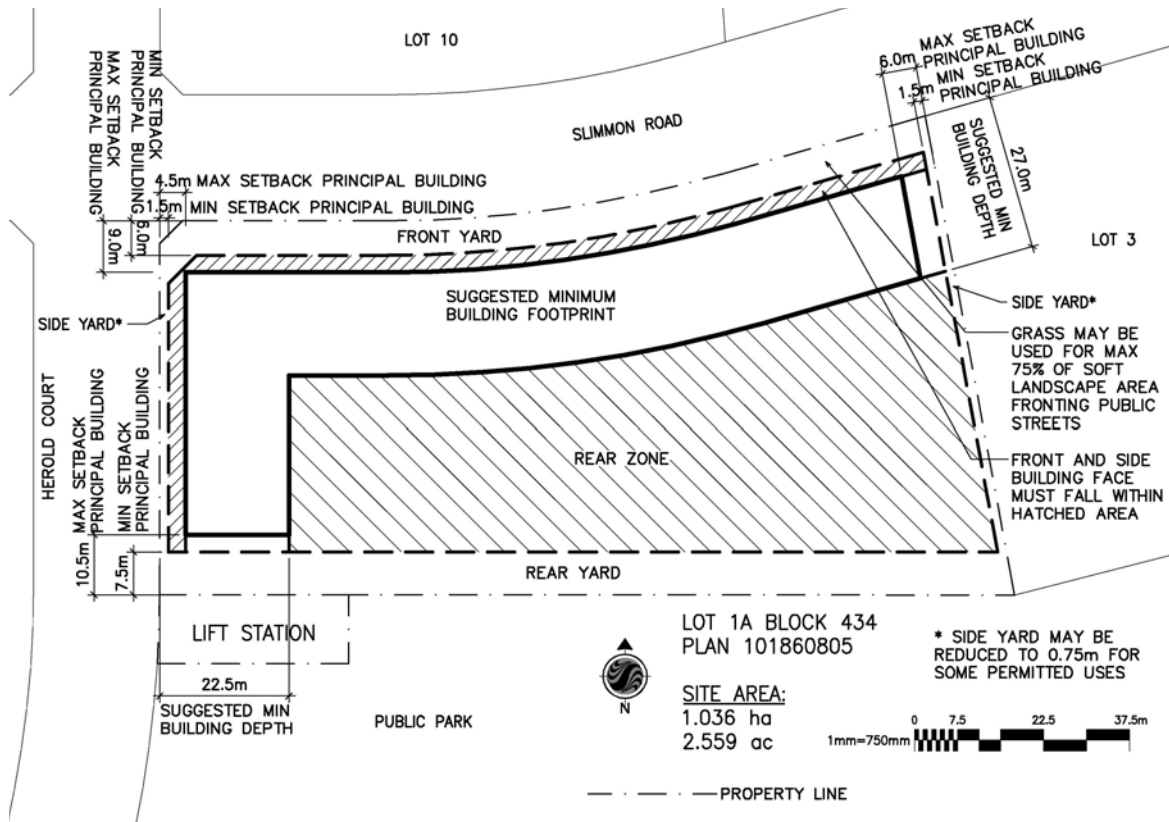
Range of Multi-Unit Apartment Building Positions for 210 Slimmon Road
